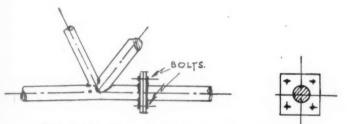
DETAIL. JOINT FOR SMALL SPANS.
